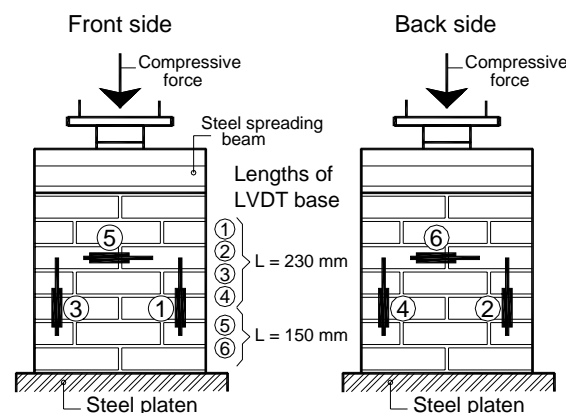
Positions of LVDTs at masonry wall specimen's front and back side
